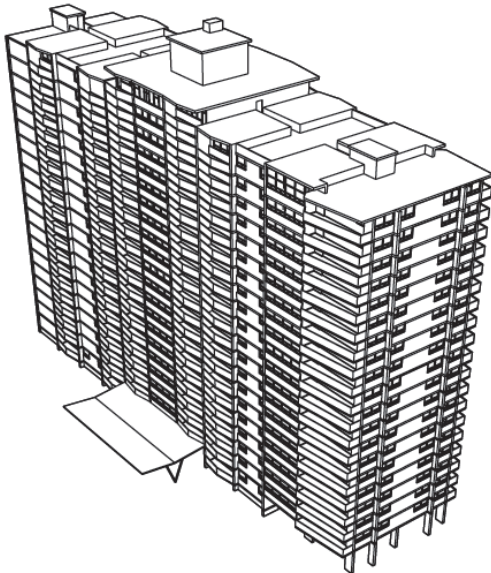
Axonometric view of the archetype tower (Kesik & Saleff, 2009)
